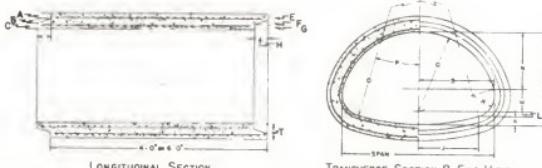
PLATED END TERMINAL SECTION WILL BE SECURED IN LENGTH OF PIPE BY WIRE OR PLATE.
